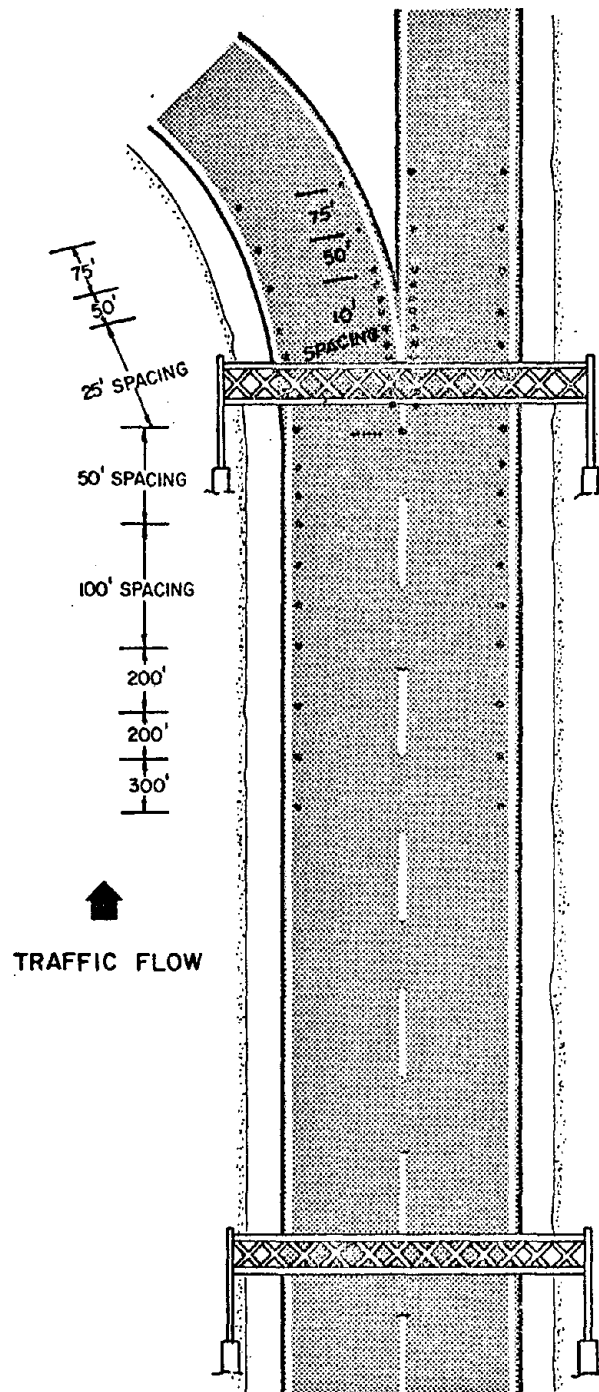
Arrangement of Raised Pavement Markers at I-75 Northbound - I-64 Eastbound Lane Split East of Lexington. (Pigman and Agent, 1974)
